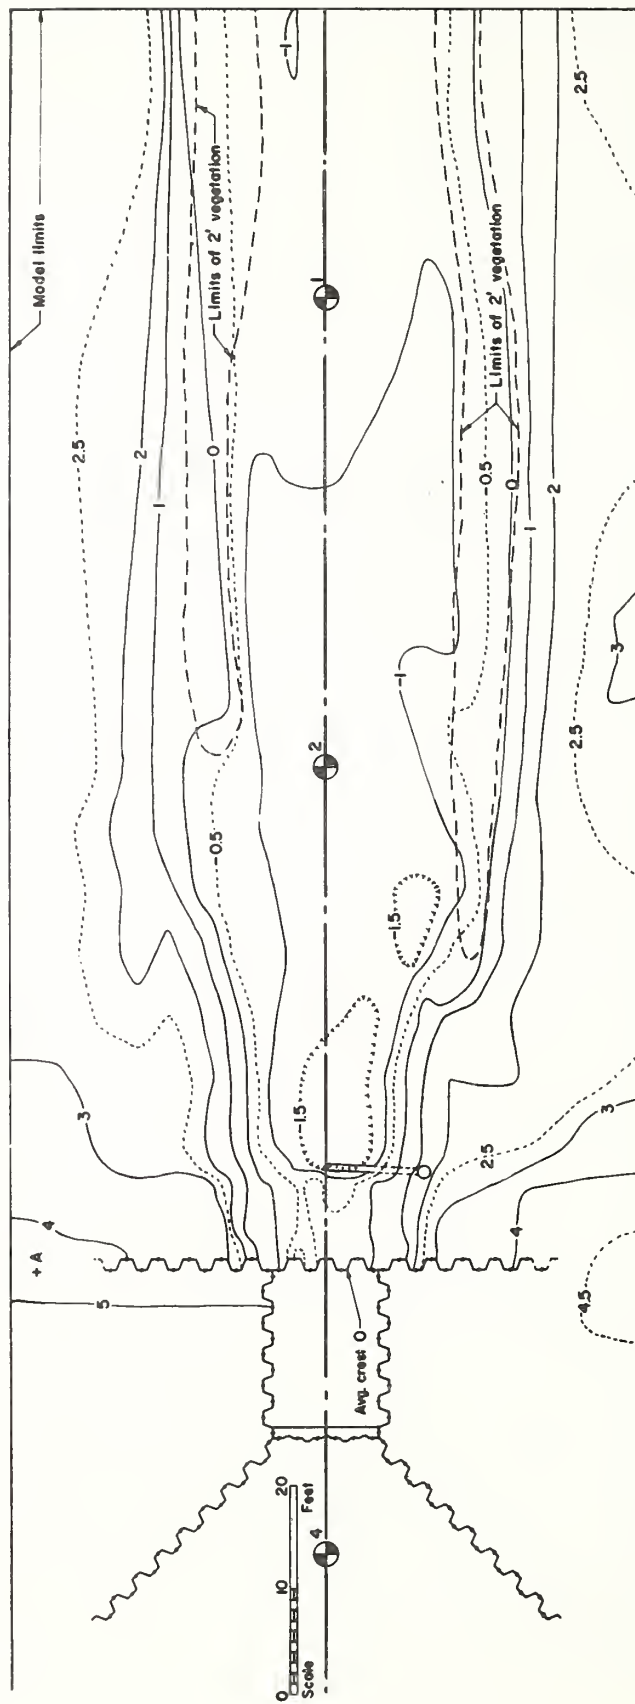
Layout and topography for prototype structure S-13B, showing current field approach condition.
